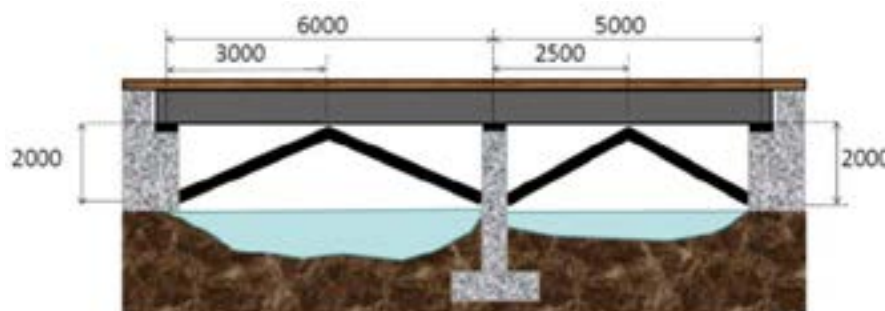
Design Short 3 – bridge elevation showing inclined struts
